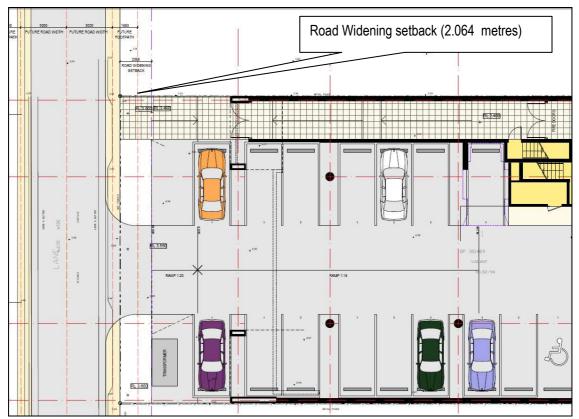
Road Widening Area (Source: morrisbray Architects, Drawing DA-04 dated 27/07/2009))
